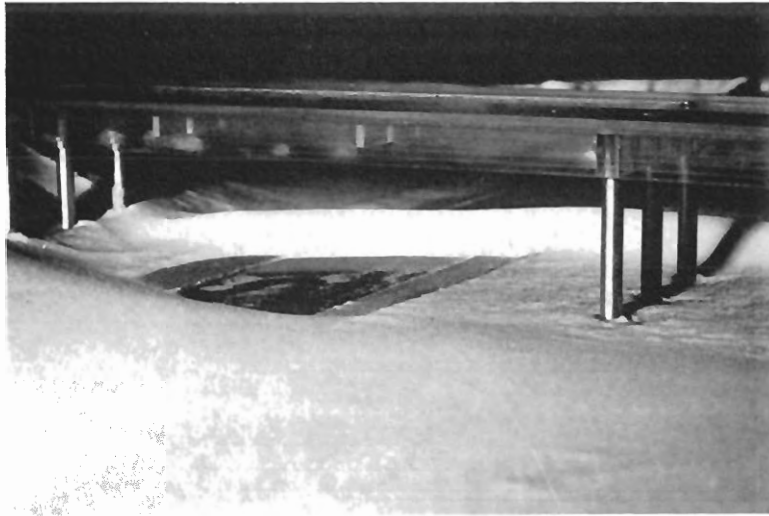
Run 12-7-1, uncontrolled highway bridge model. Wind direction at 20° to bridge centerline.
